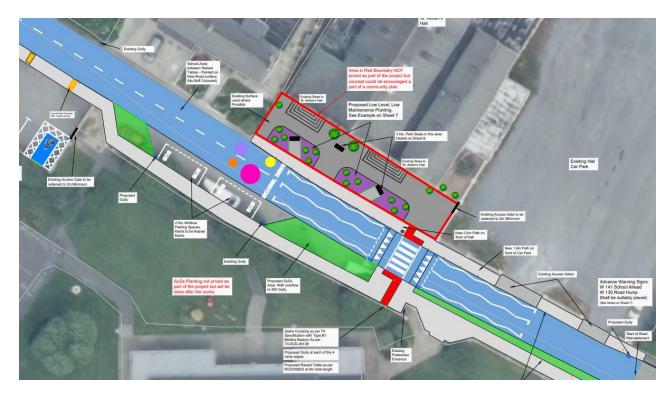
Example of design drawing for Adamstown NS Safe Routes To School Scheme. Examples of SUD areas, road marking, bollards, signage, tactile paving, and raised crossings are shown.
